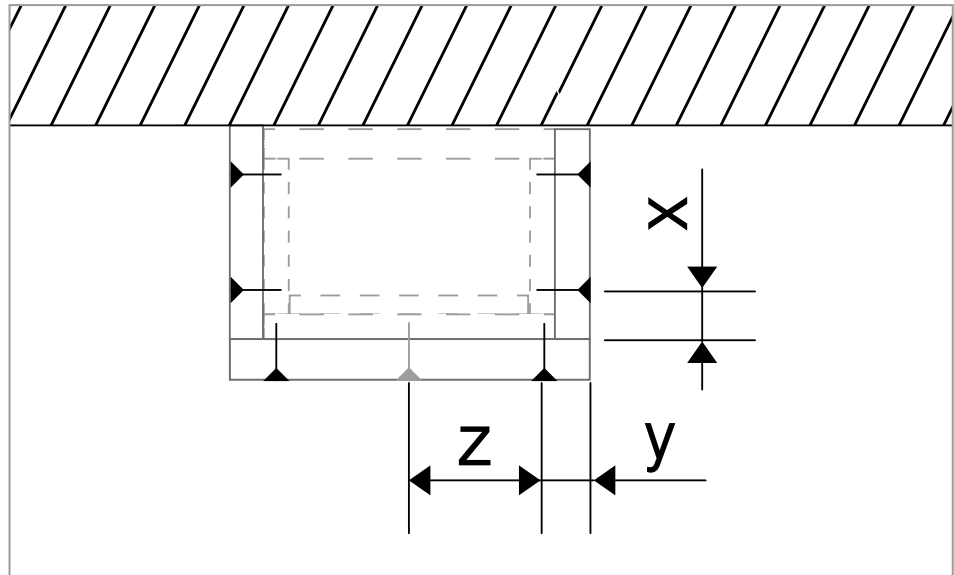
Position of drilling holes for PLCD... wall connection collar
